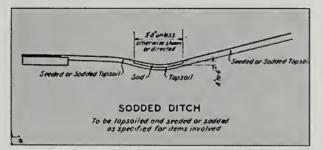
Detail of vegetated ditch, 1957. (U.S. Department of Commerce, Bureau of Public Roads, Project 22A1, Sheet 6 of 12, May 1957)
